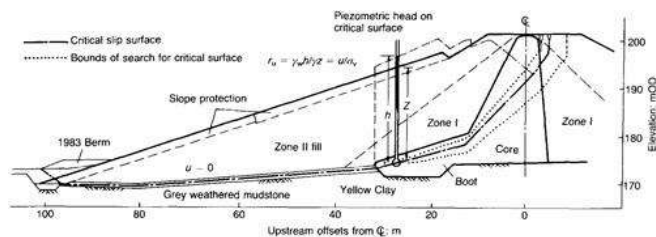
Cross-section of initial surface of slope failure within the original Carsington Dam.
